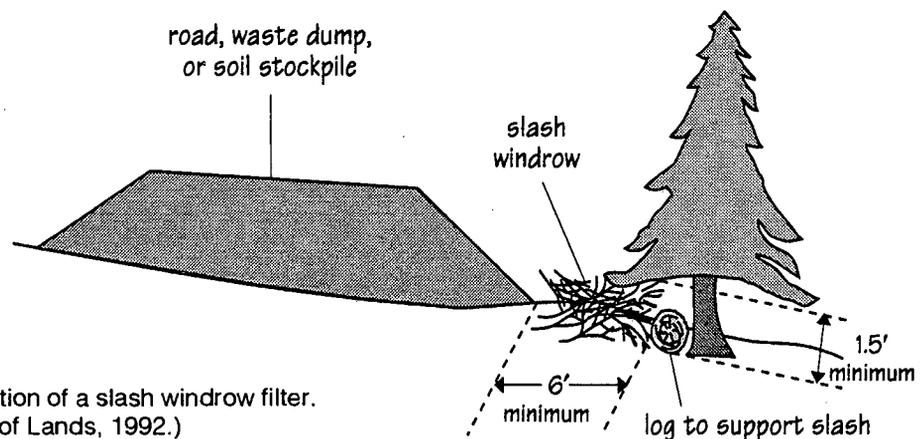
Details of construction of a slash windrow filter. (Modified from Idaho Department of Lands, 1992.)
